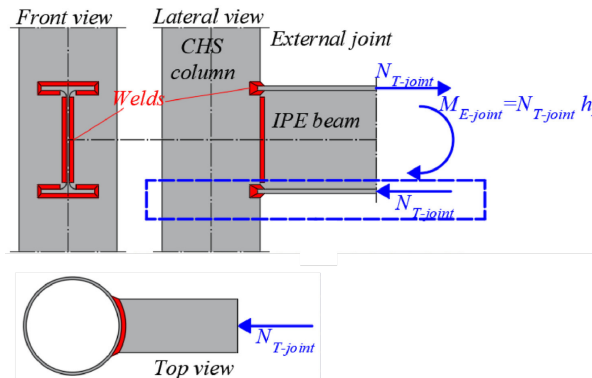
Welded I-beam-to-CHS-column joint [58]
